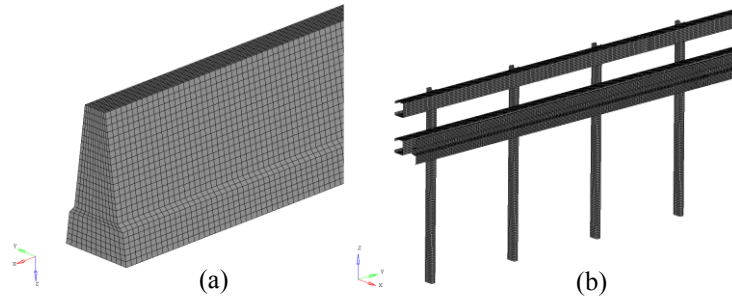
Developed simulation models for (a) concrete wall; (b) steel guardrail
